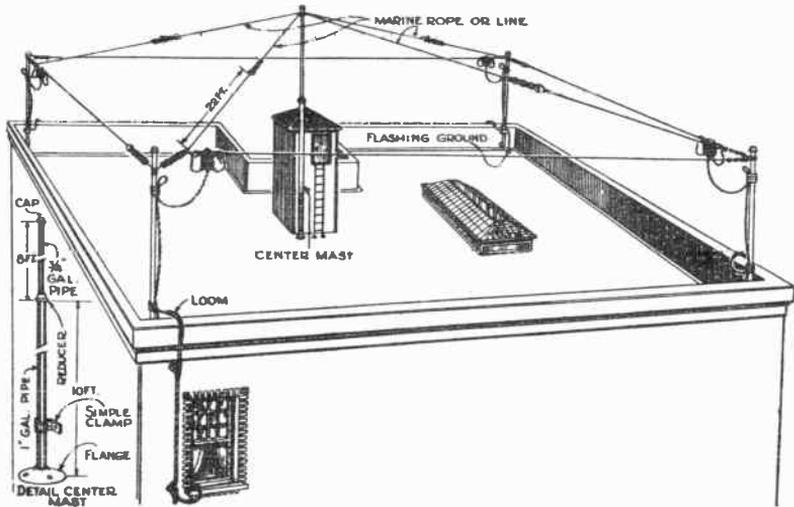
Installation involving 4 master antenna systems on the roof of a large apartment building. Each system serves one vertical row of 20 apartments.
